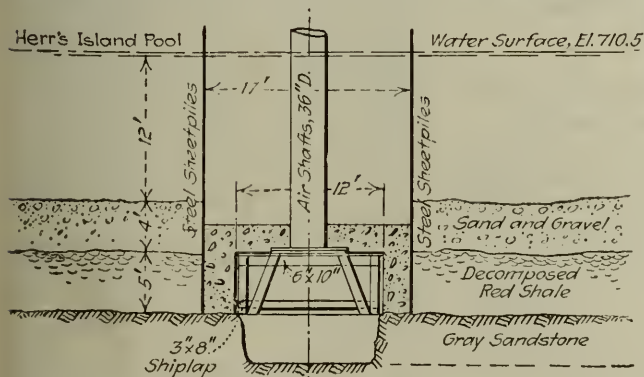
CROSS-SECTION OF AIR BELL IN COFFERDAM, PIER N FOUNDATION. B. & O. BRIDGE, PITTSBURGH
